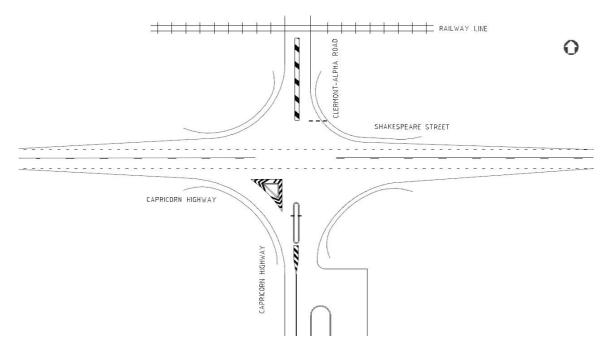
Capricorn Highway and Clermont-Alpha Road Intersection Layout
